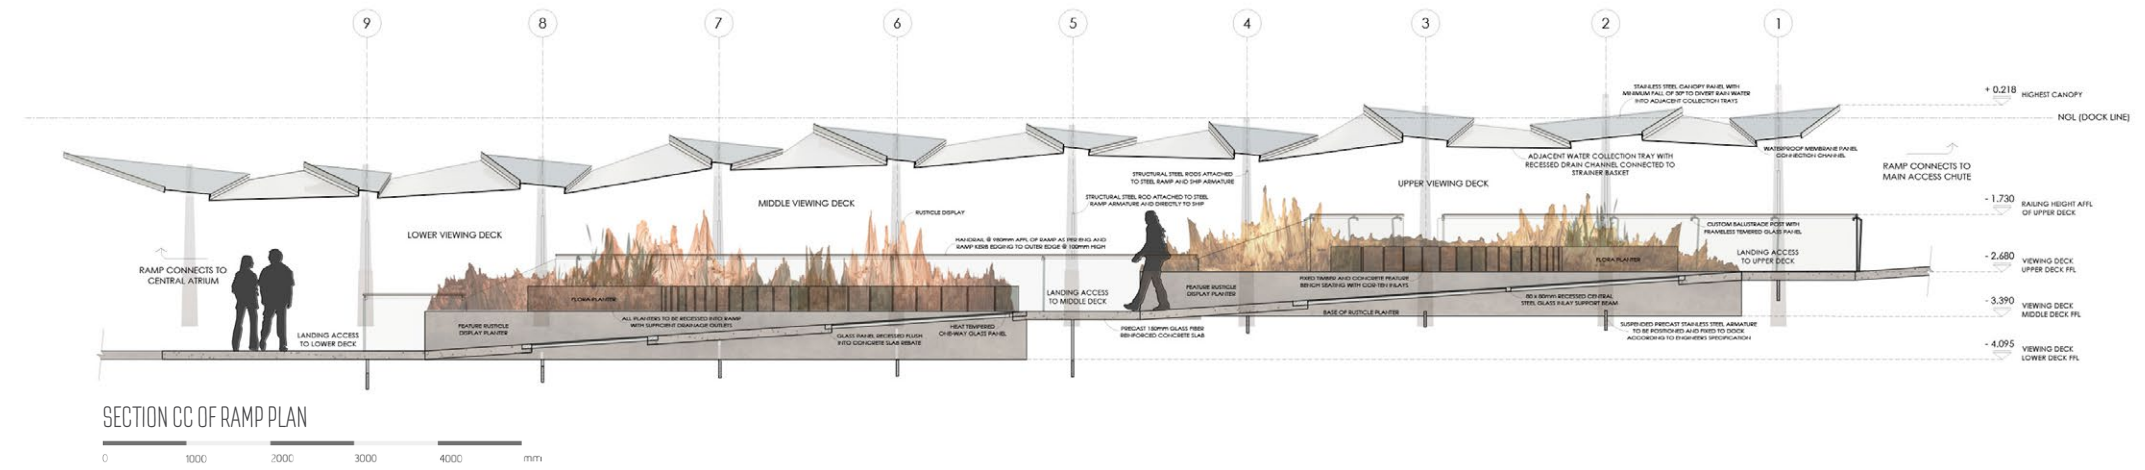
Final Iteration of Proposed Scenic Ramp Section and Layout (Author, 2016)
